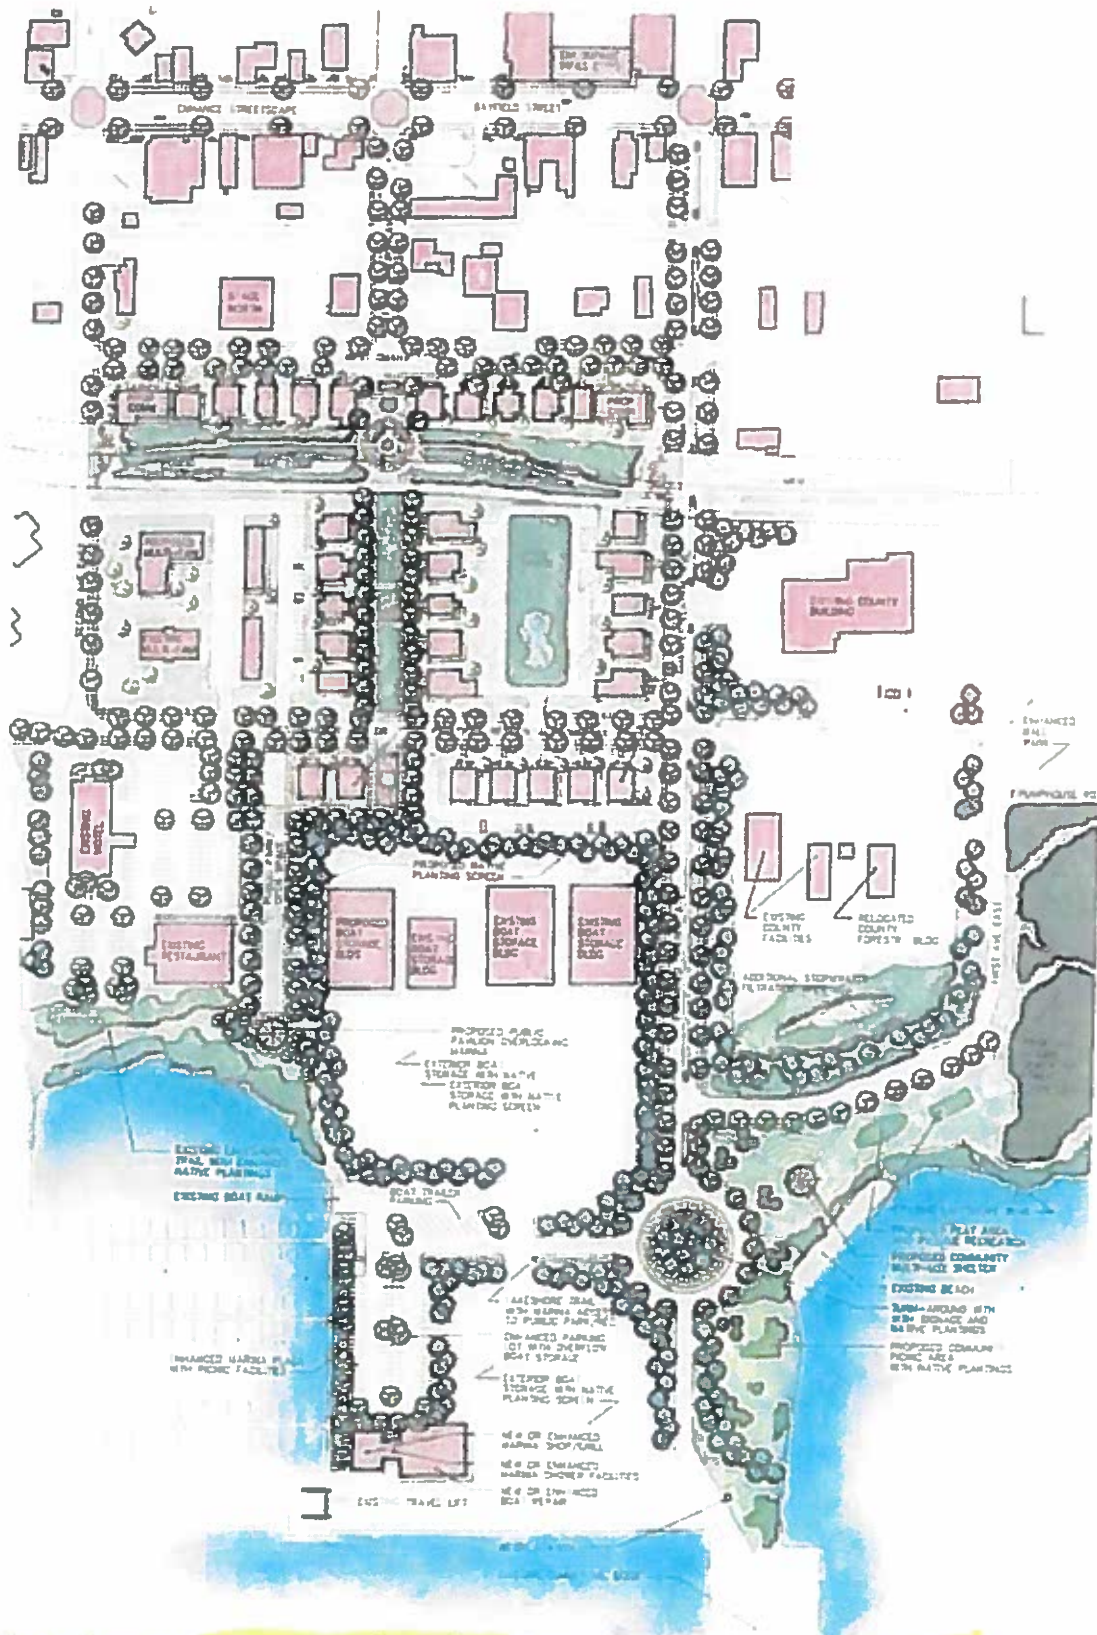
Conceptual Sketch Showing Preliminary Ideas for Redevelopment of the Central Avenue/Omaha Street Area
